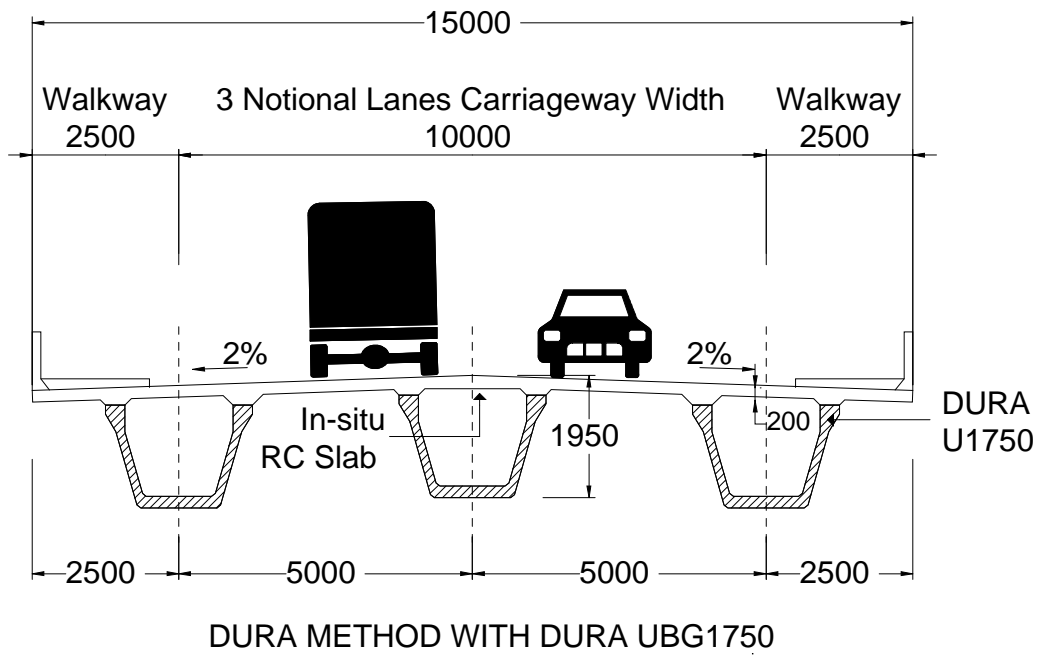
Example of a 15m wide and 40 m single span highway bridge.
